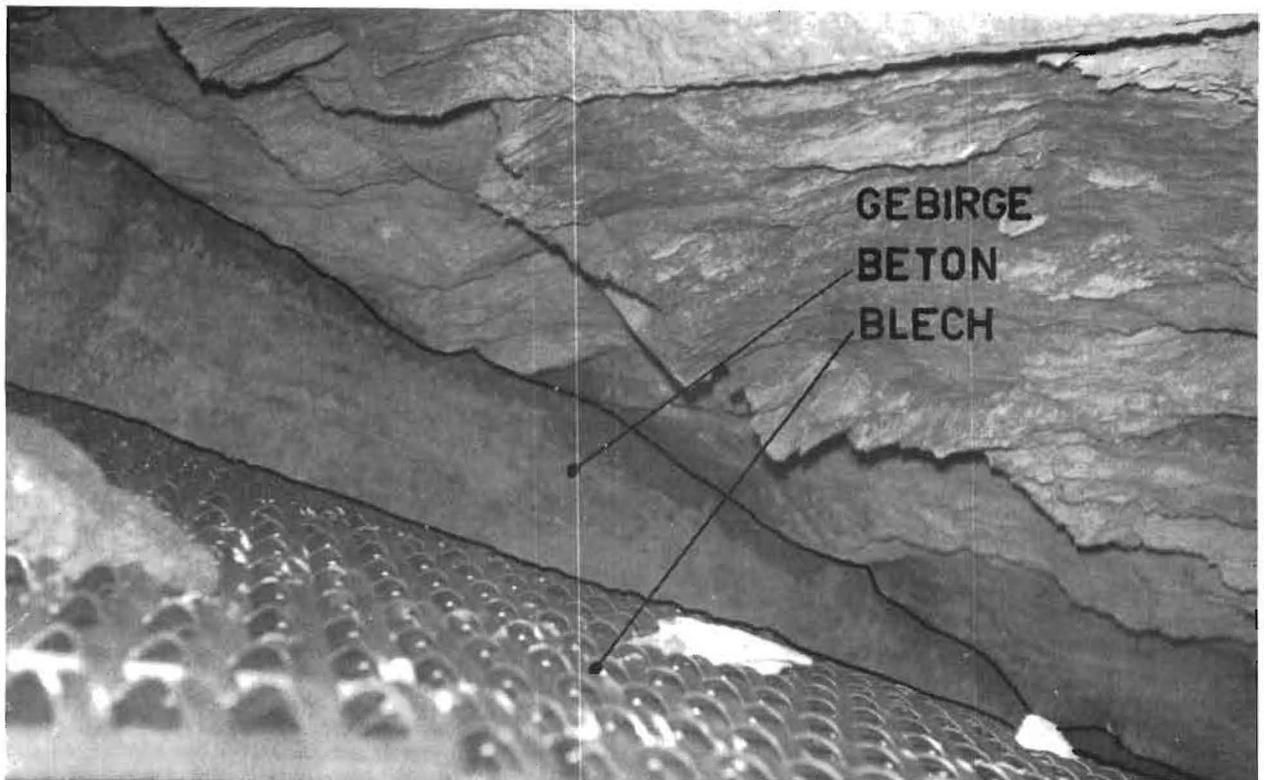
ROCK - CONCRETE - SHEET / ROCHE - BETON - TOLE
